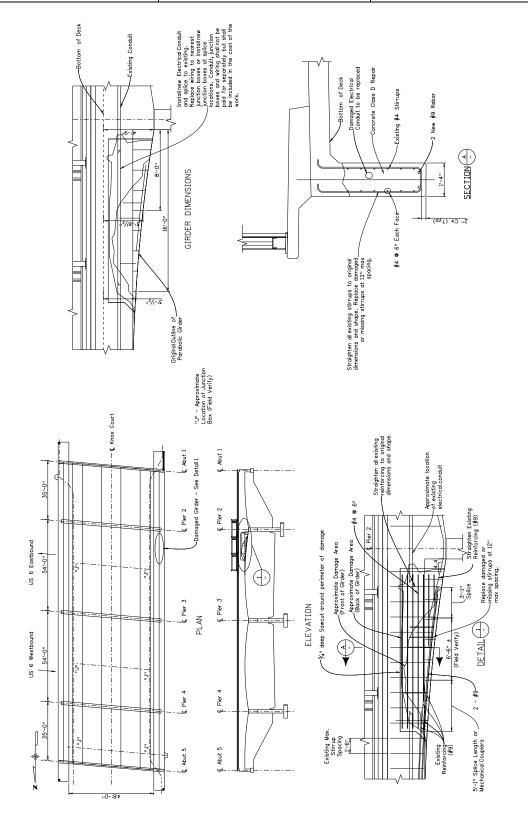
(E)-2 Sample Plan of Concrete Tee Girder Repair
